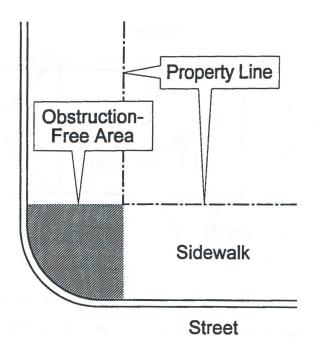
Obstruction-Free Area (adapted from the Portland Pedestrian Master Plan)
